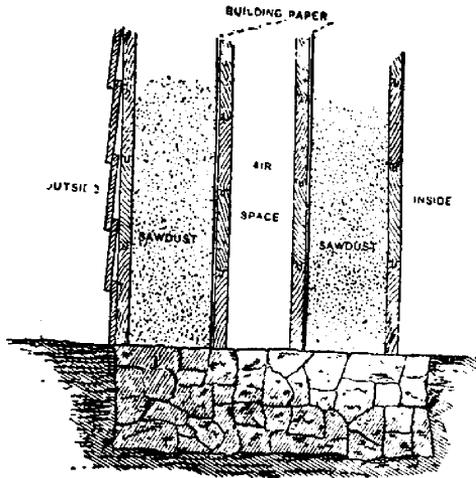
WALL OF FRUIT-STORAGE CELLAR.
